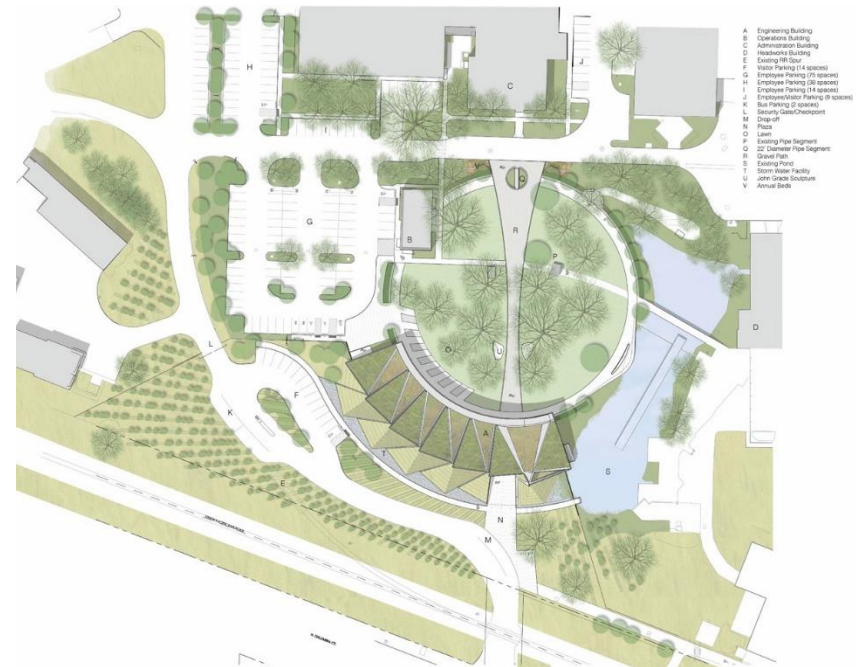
Columbia Boulevard Wastewater Treatment Support Facility Site Plan
